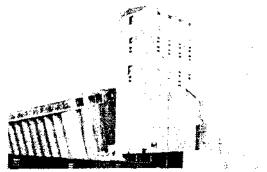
TRANSCONA SILO, DETAIL OF MOVEMENT AFTER FAILURE SHOWING UNDAMAGED WORK HOUSE
